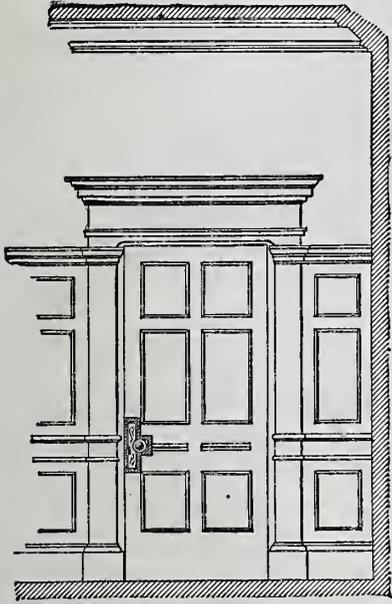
Elevation of Door.—Scale, $\frac{1}{4}$ Inch to the Foot.
